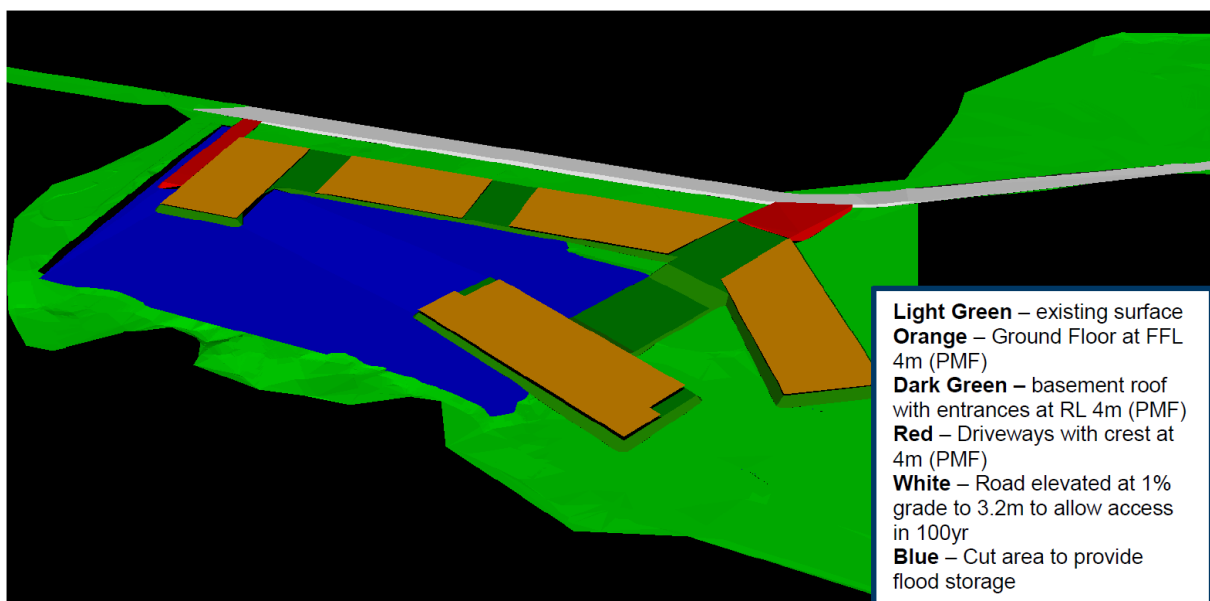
Cut/Fill Development Plan (Source: Flood Planning Assessment – Calibre Consulting, 21 August 2019)
